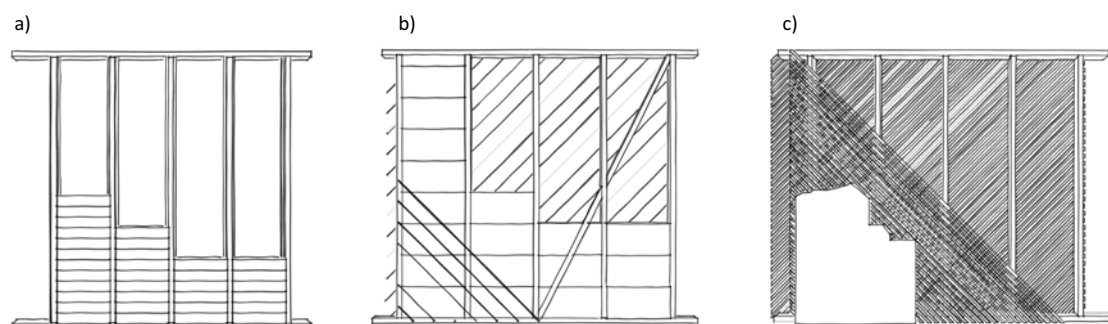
Traditional mixed earth and wood constructions: “adobillo”, “pandereta de adobe” and “quincha”
